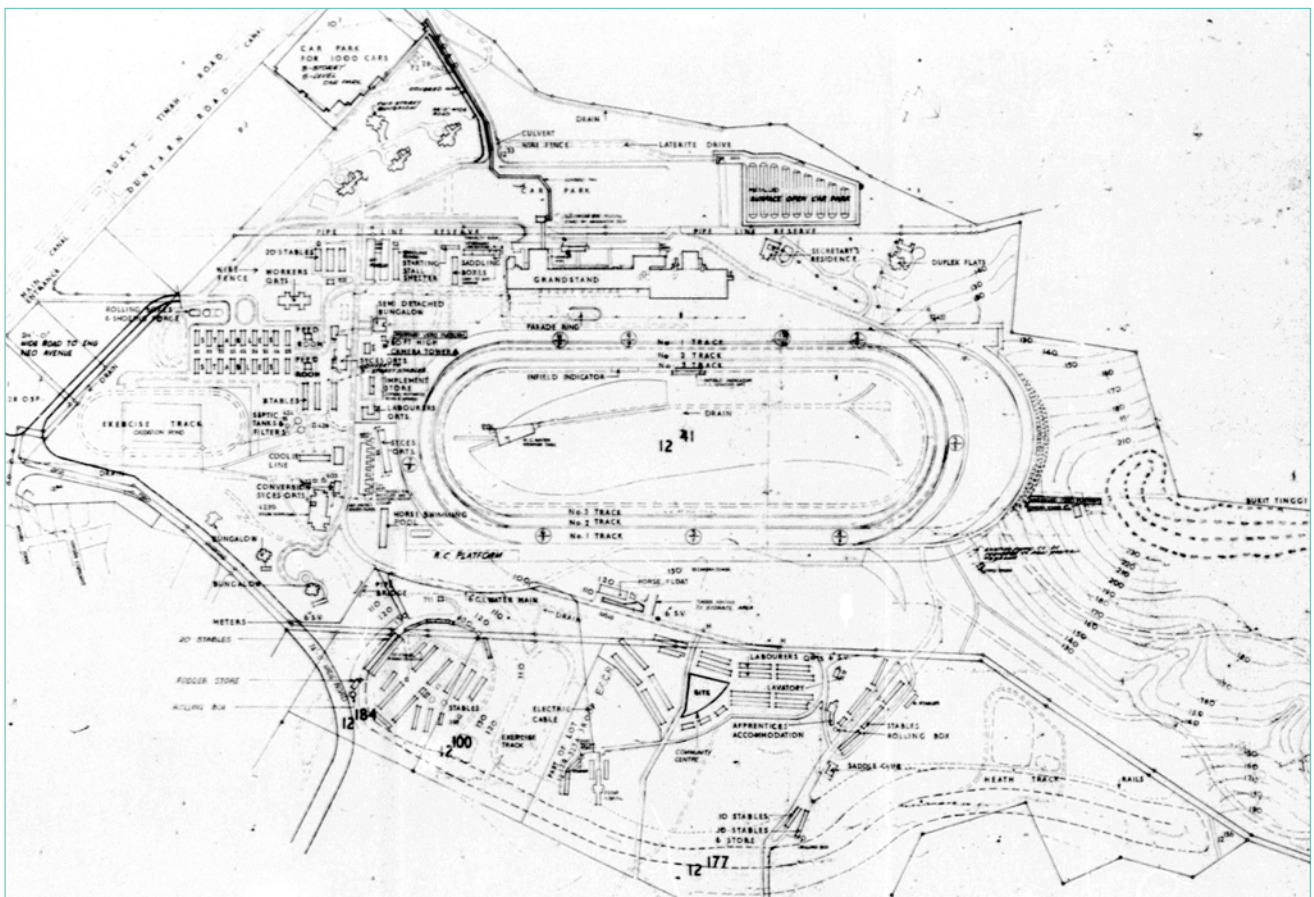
Racecourse Master Layout Plan (Source: Iversen Van Sitteren & Partners, 1981.)
